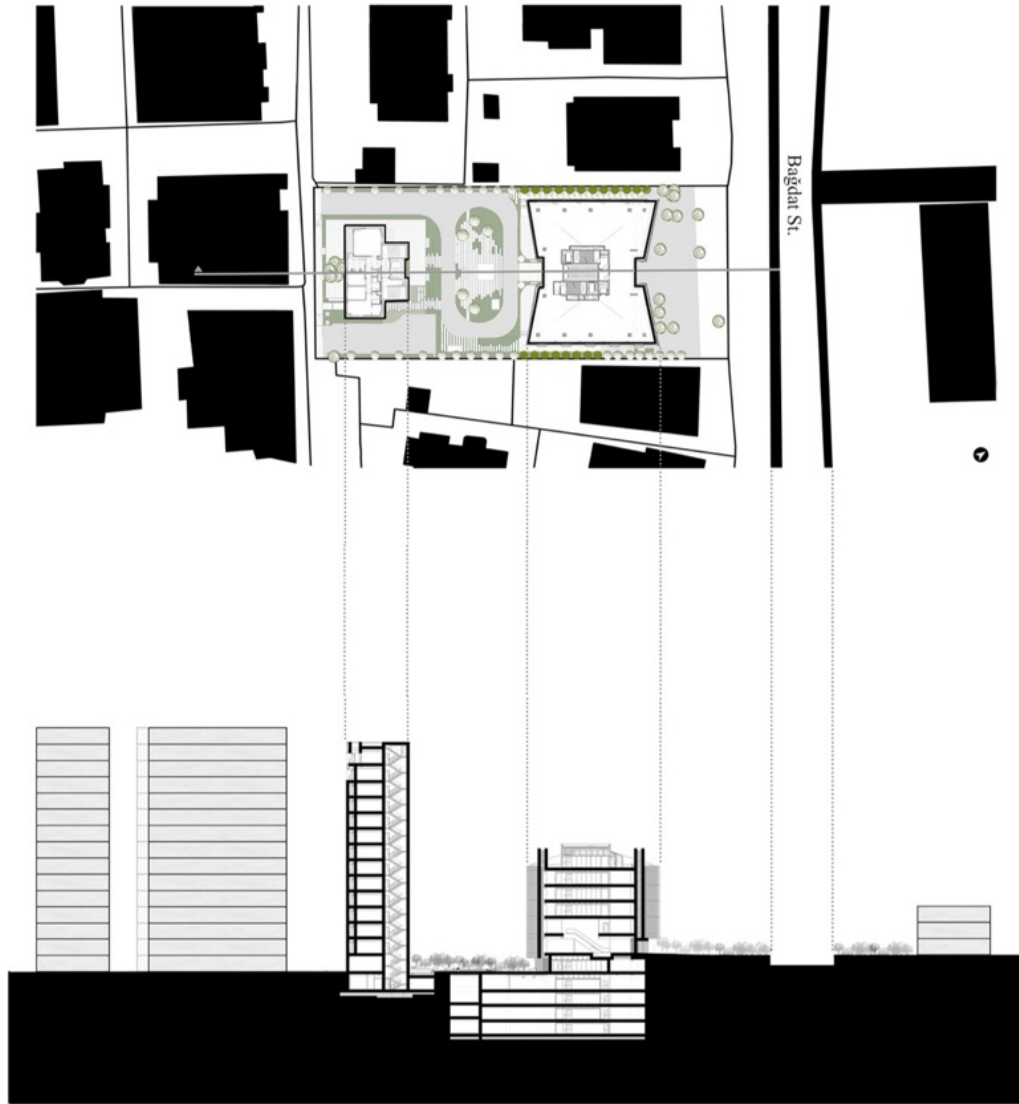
Case B Plan, Section (Serbetci-Suveydan Archives, Author)
